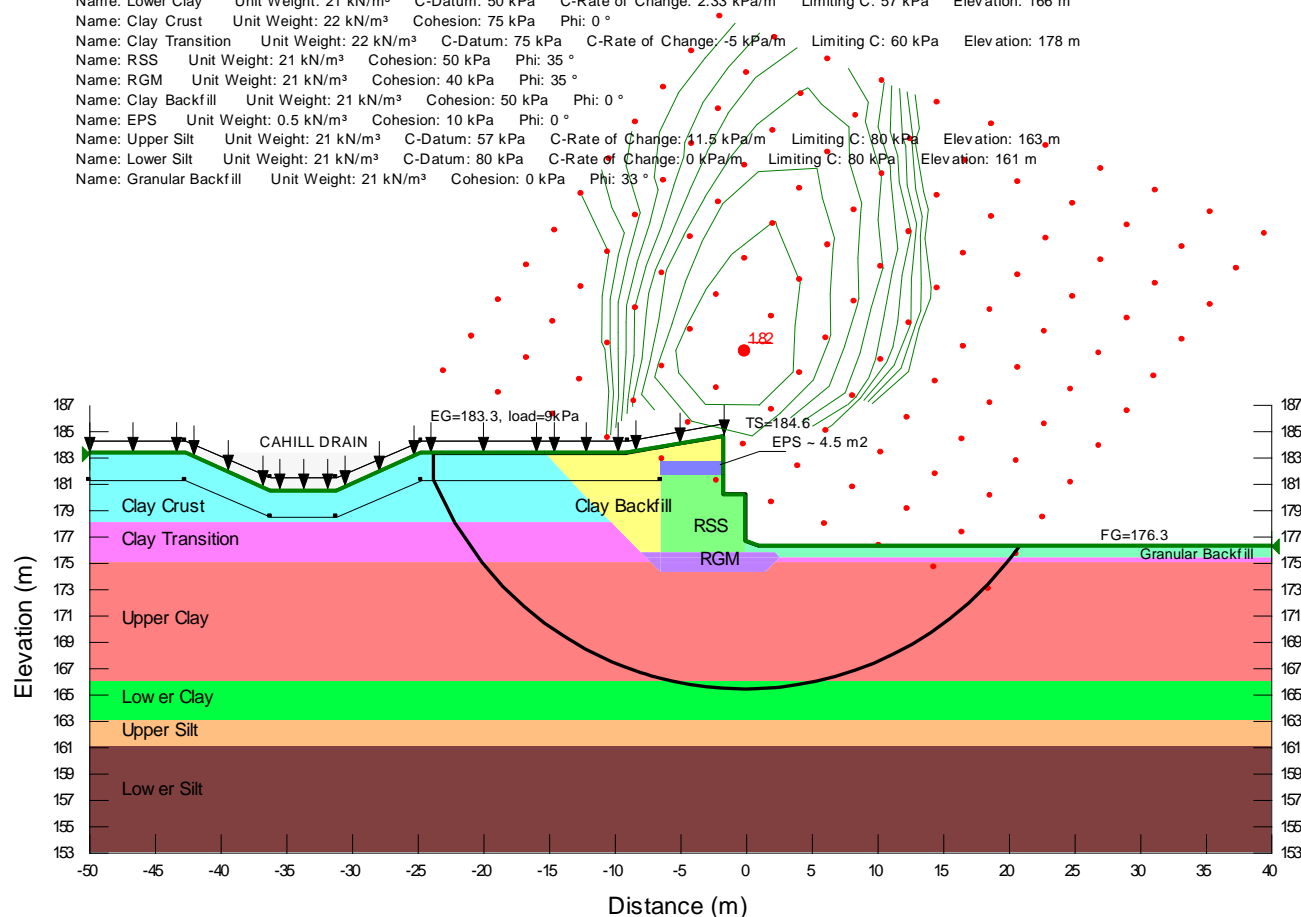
Global Stability Result – North Abutment (West Segment)– Long-term (Drained) Loading
